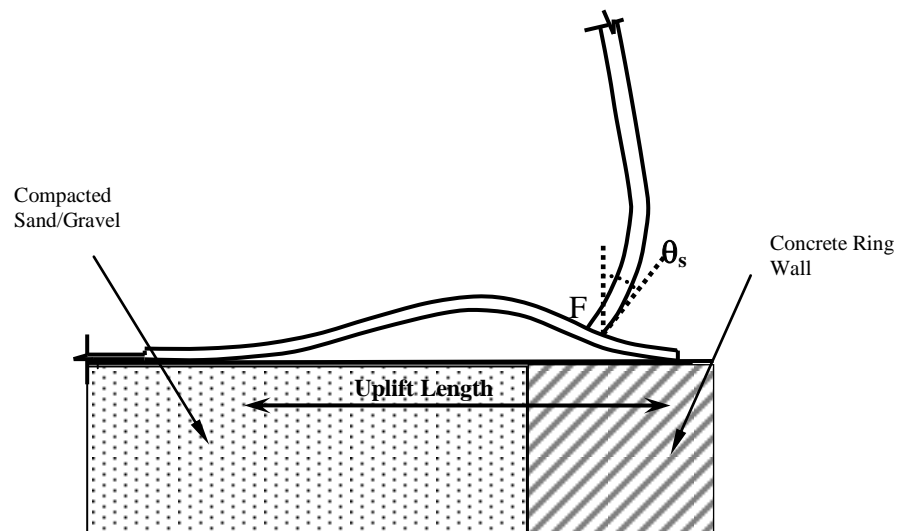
Uplift at Shell to Bottom Joint of a Tank on Concrete Ring Wall
